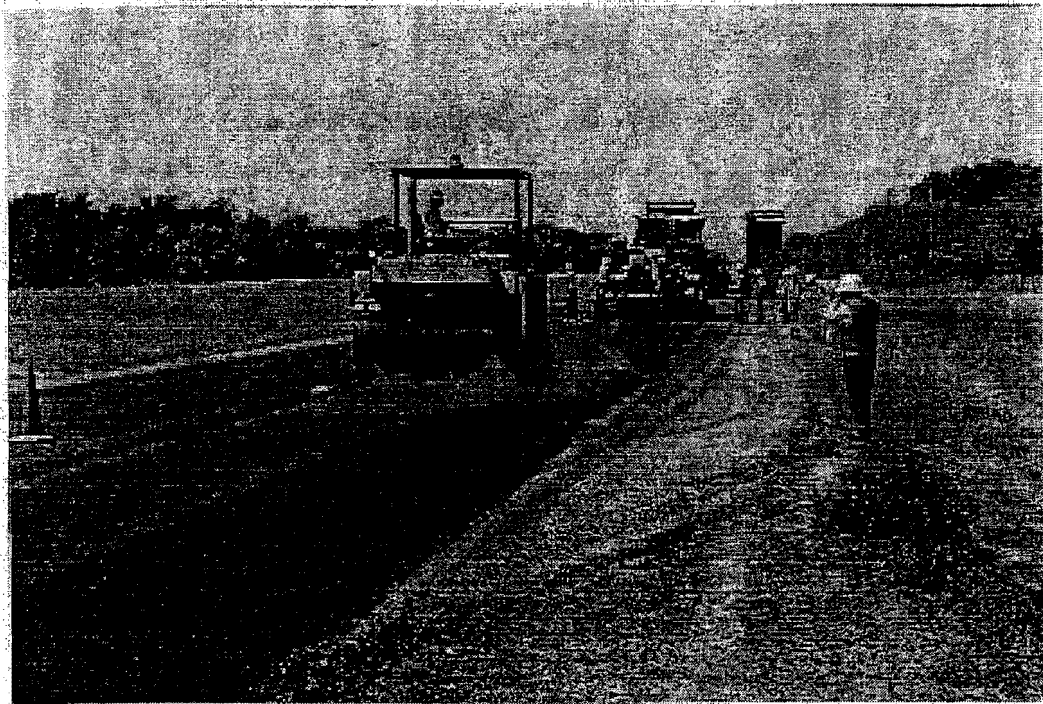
Photograph of Construction Activity on WB SH 31, Corsicana
